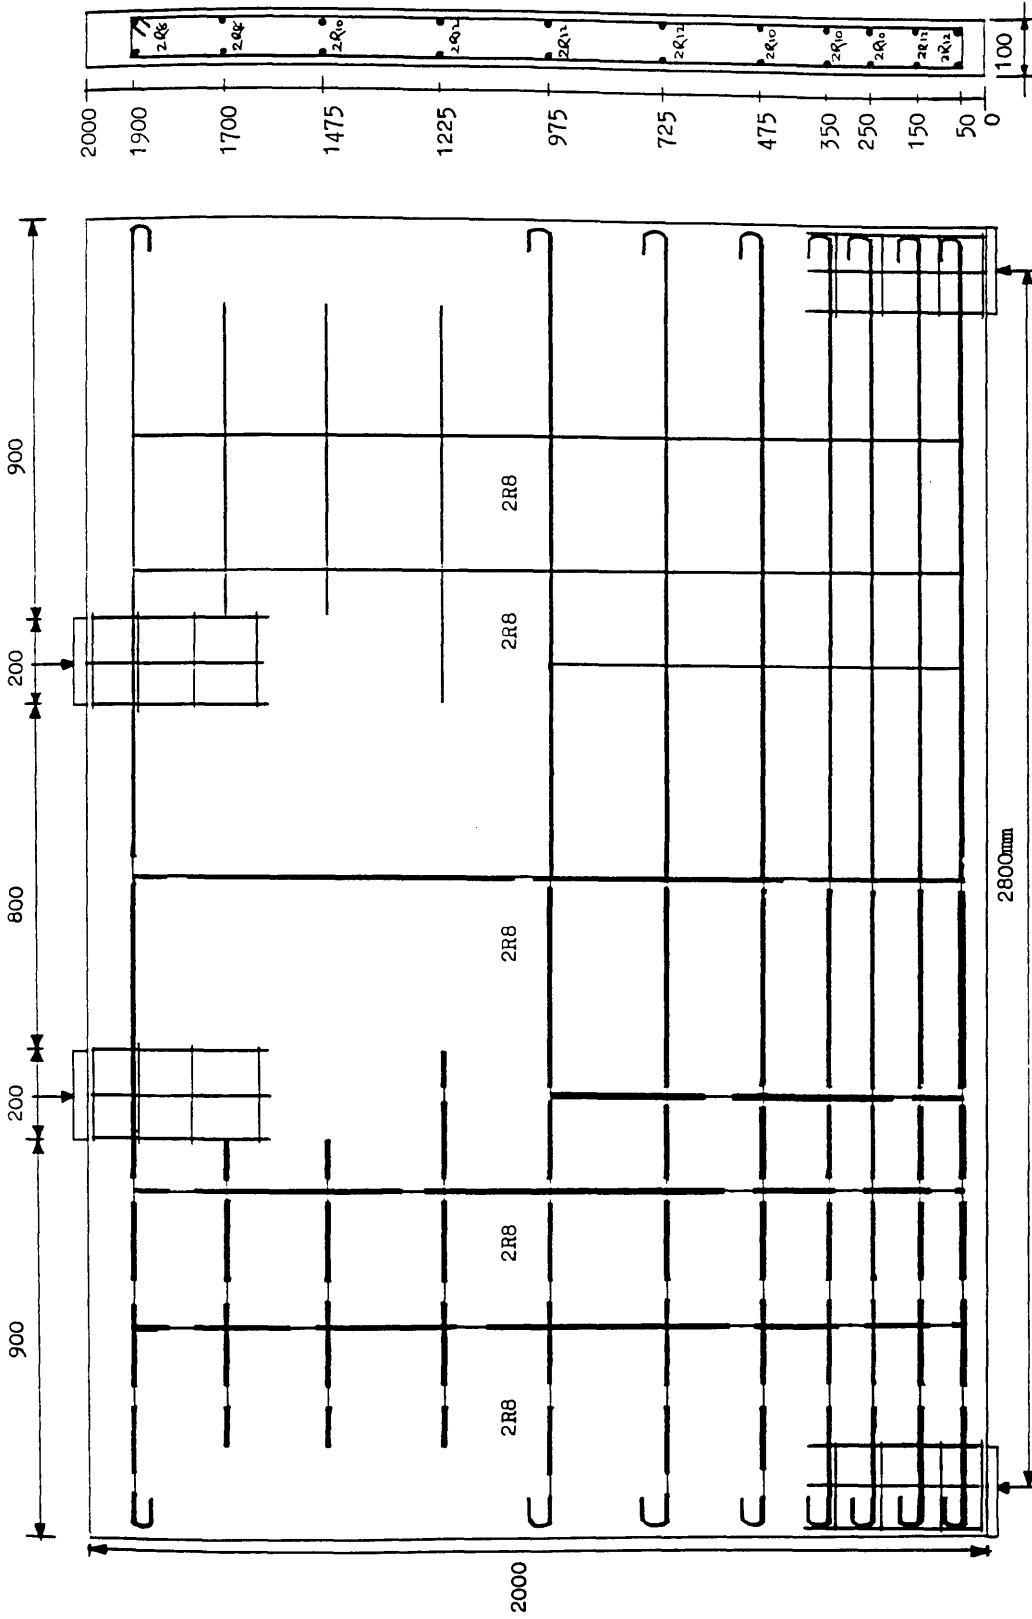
Dimensions and reinforcing details of girder TRGRAS8
